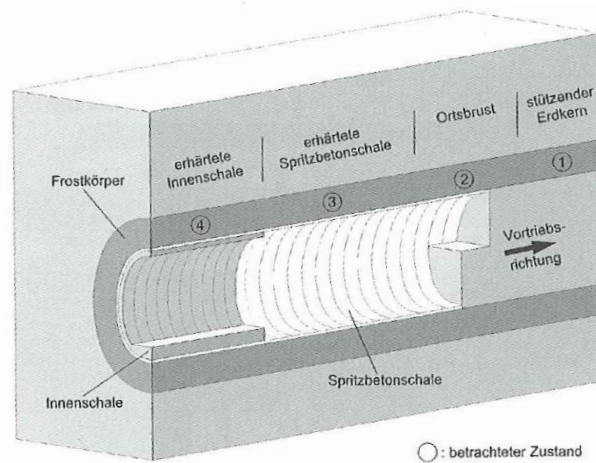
Schematic view of the construction sequence in a freezing project
